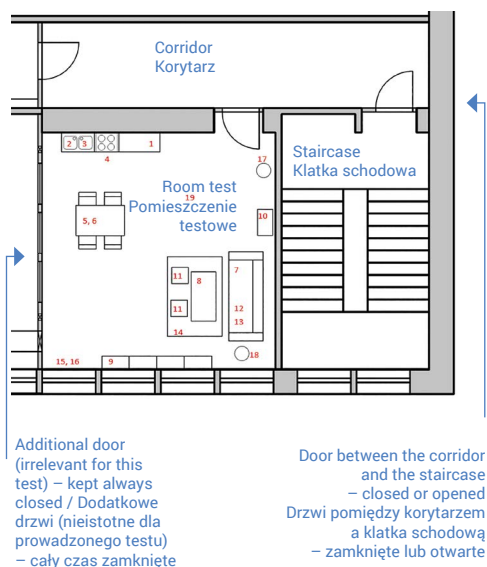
The plan of the 4th floor of the building (including the test room and the corridor)
